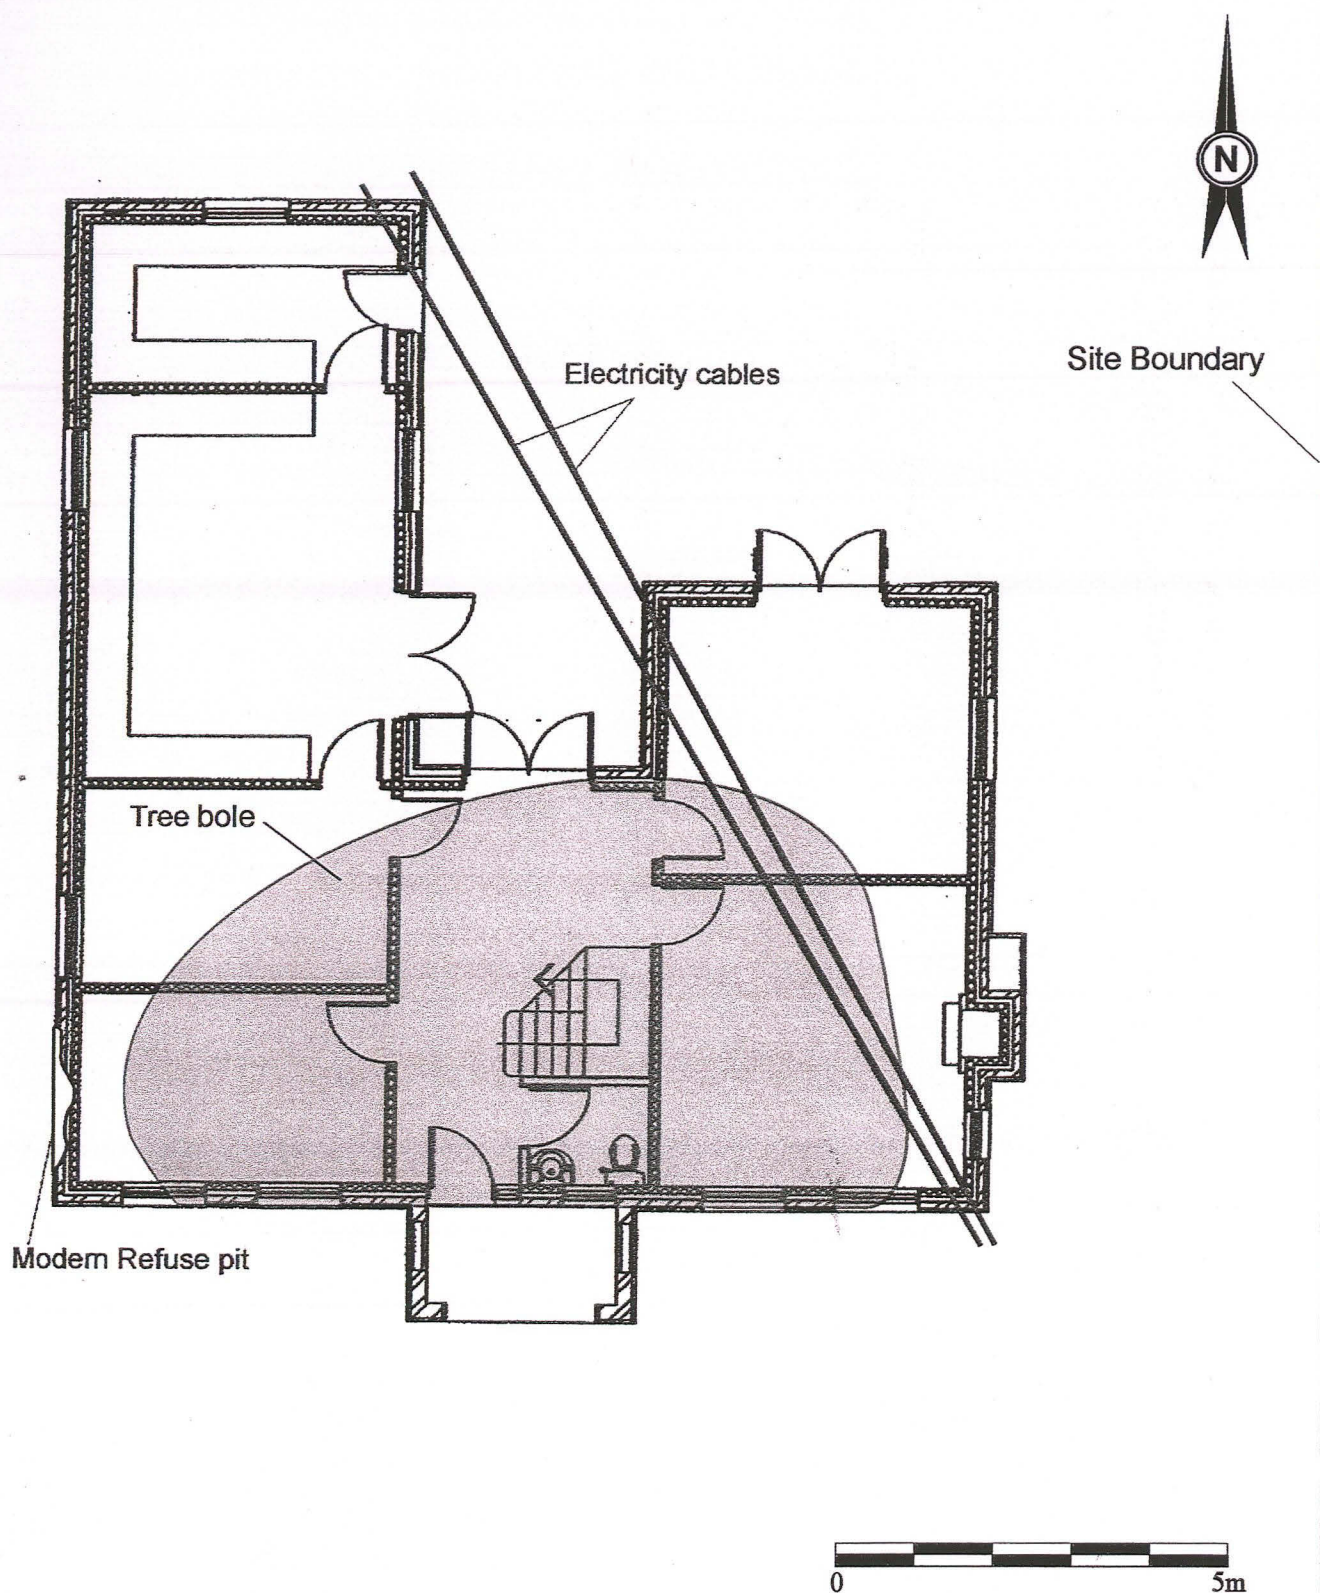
Plan of the house footings and observed features (taken from a plan supplied by the client)
